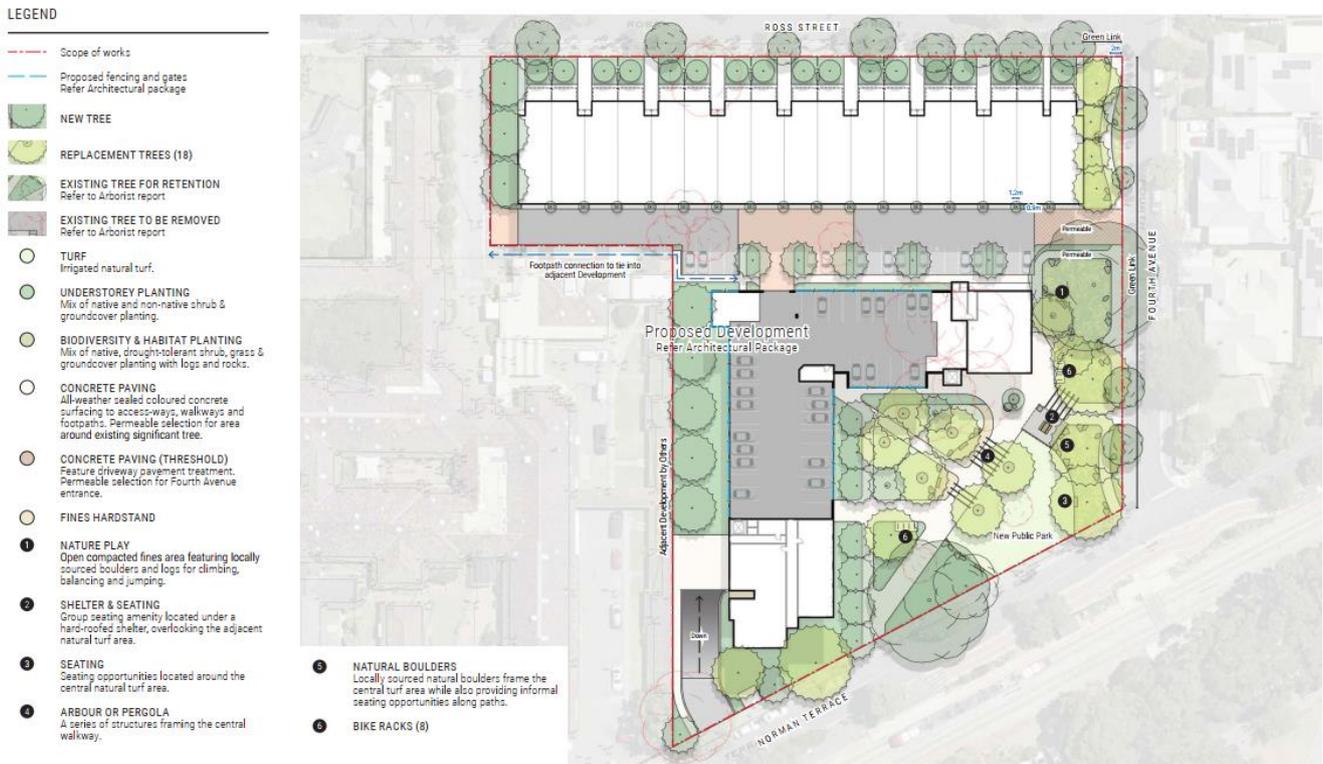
GD Studia Concept Landscape Plan showing location of replacement trees
